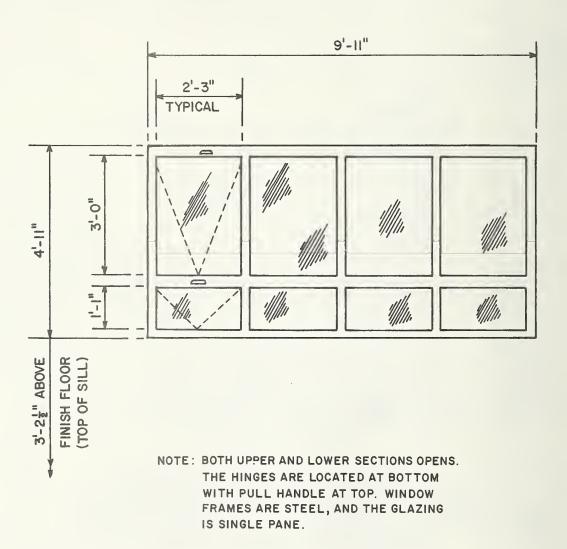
Schematic of a Window Section of the Ventilation Test Classroom
